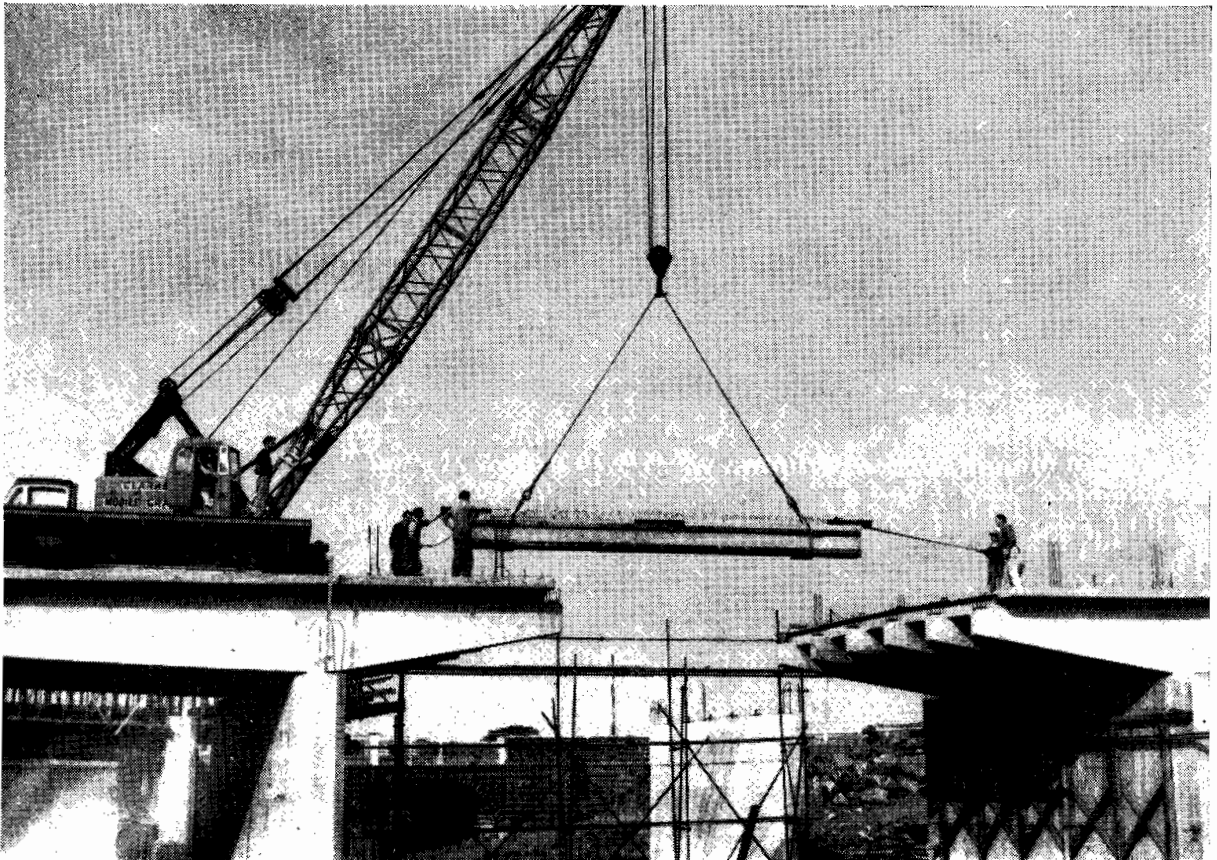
Two new bridges over Kororoit Creek on the Princes Highway West, being portion of dual lane highway under construction. Illustration shows the western lane bridge, the first precast beam to complete the final span.
